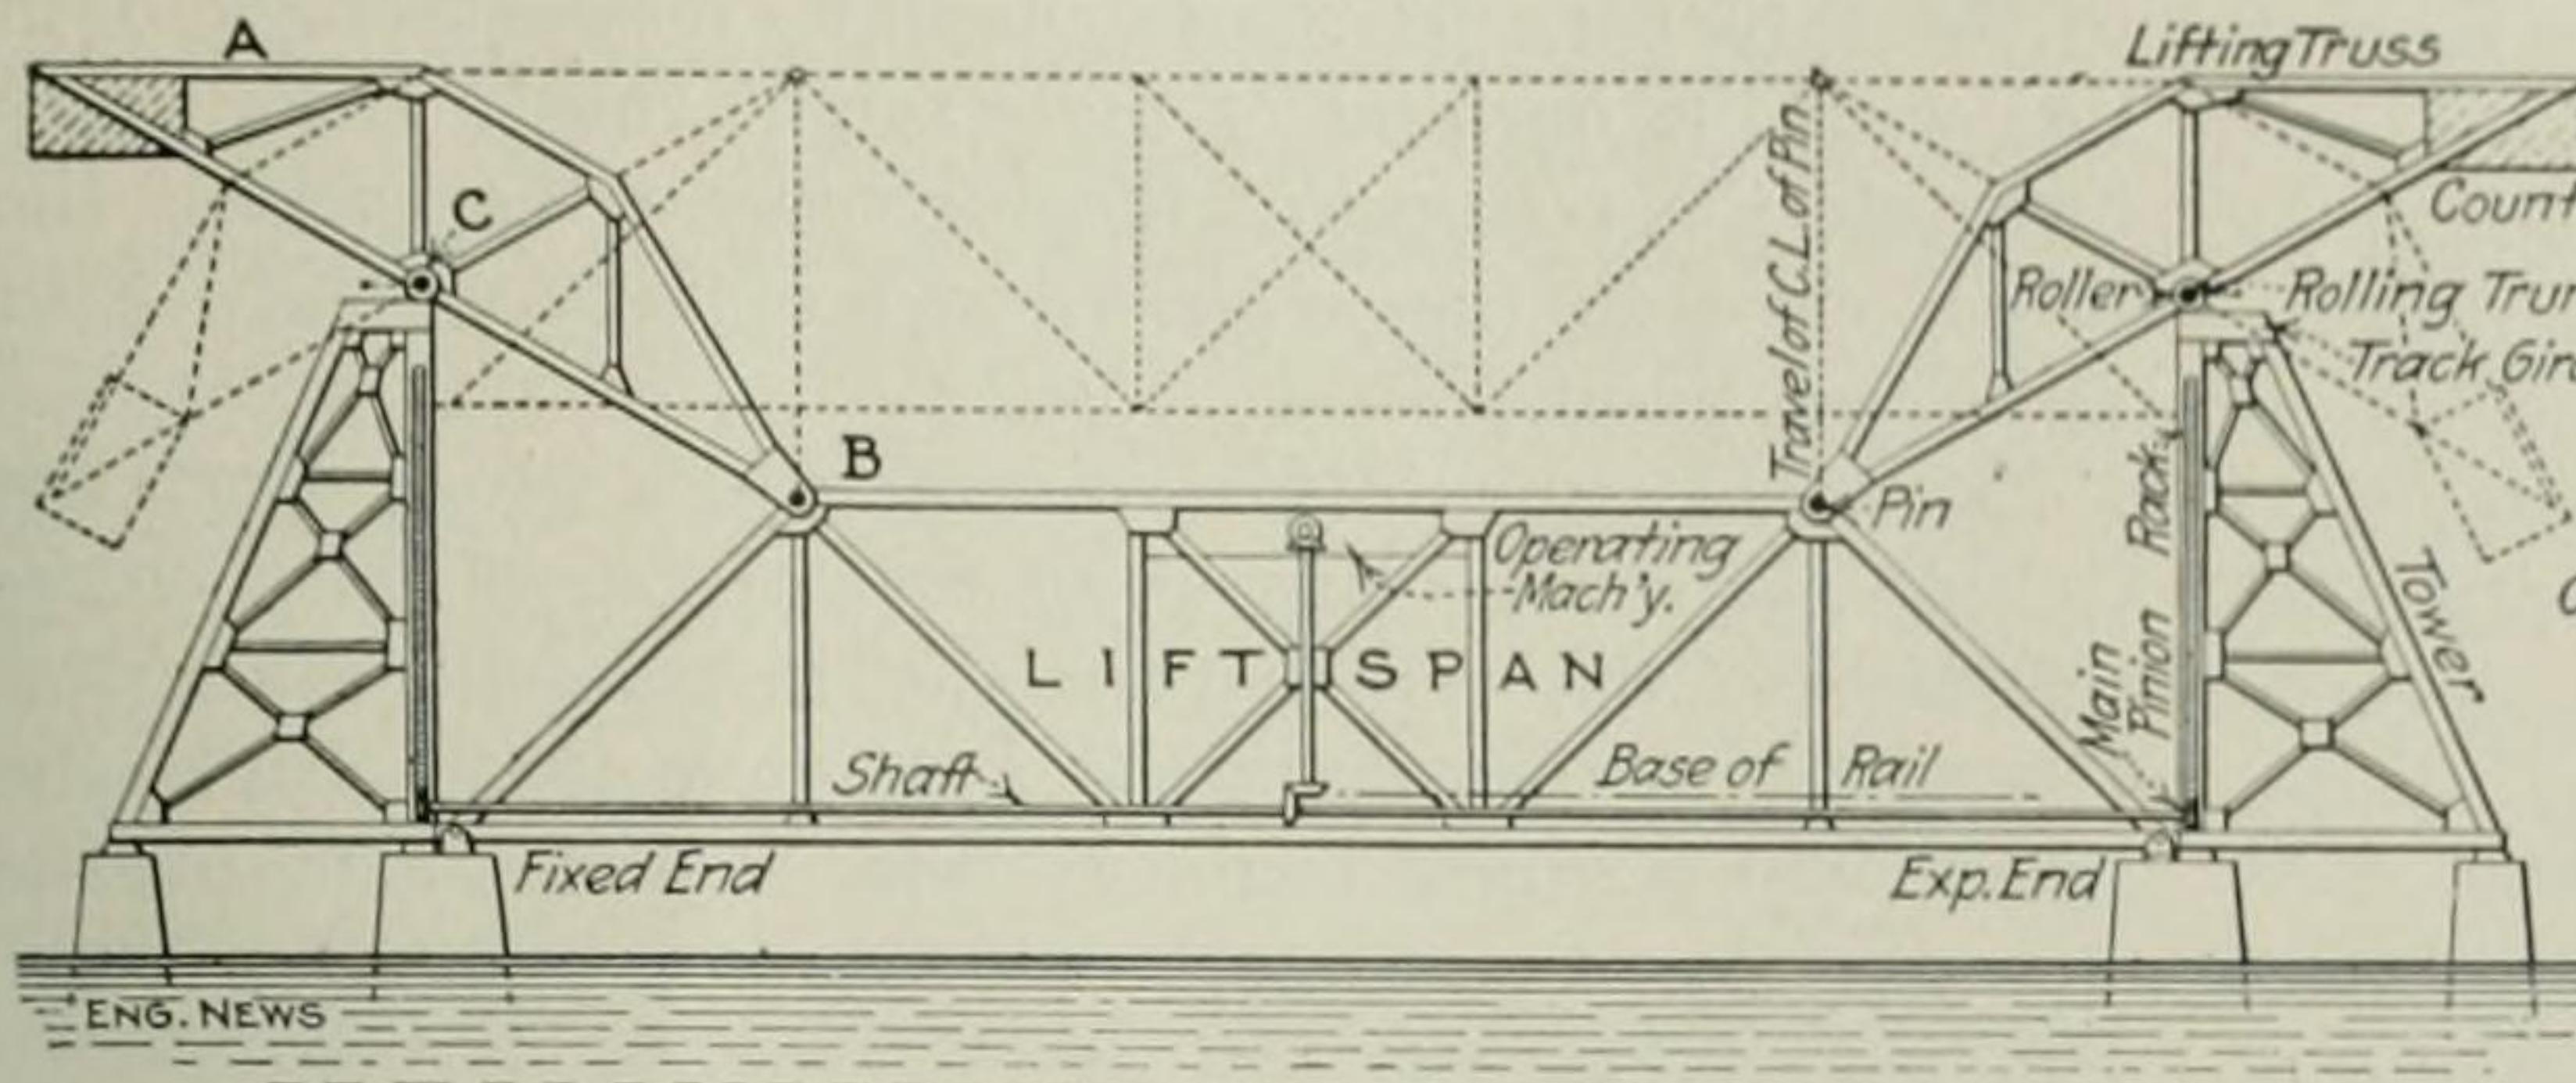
DESIGN OF VERTICAL-LIFT DRAWBRIDGE WITHOUT CABLES (Strobel Steel Construction Co., Chicago.)
